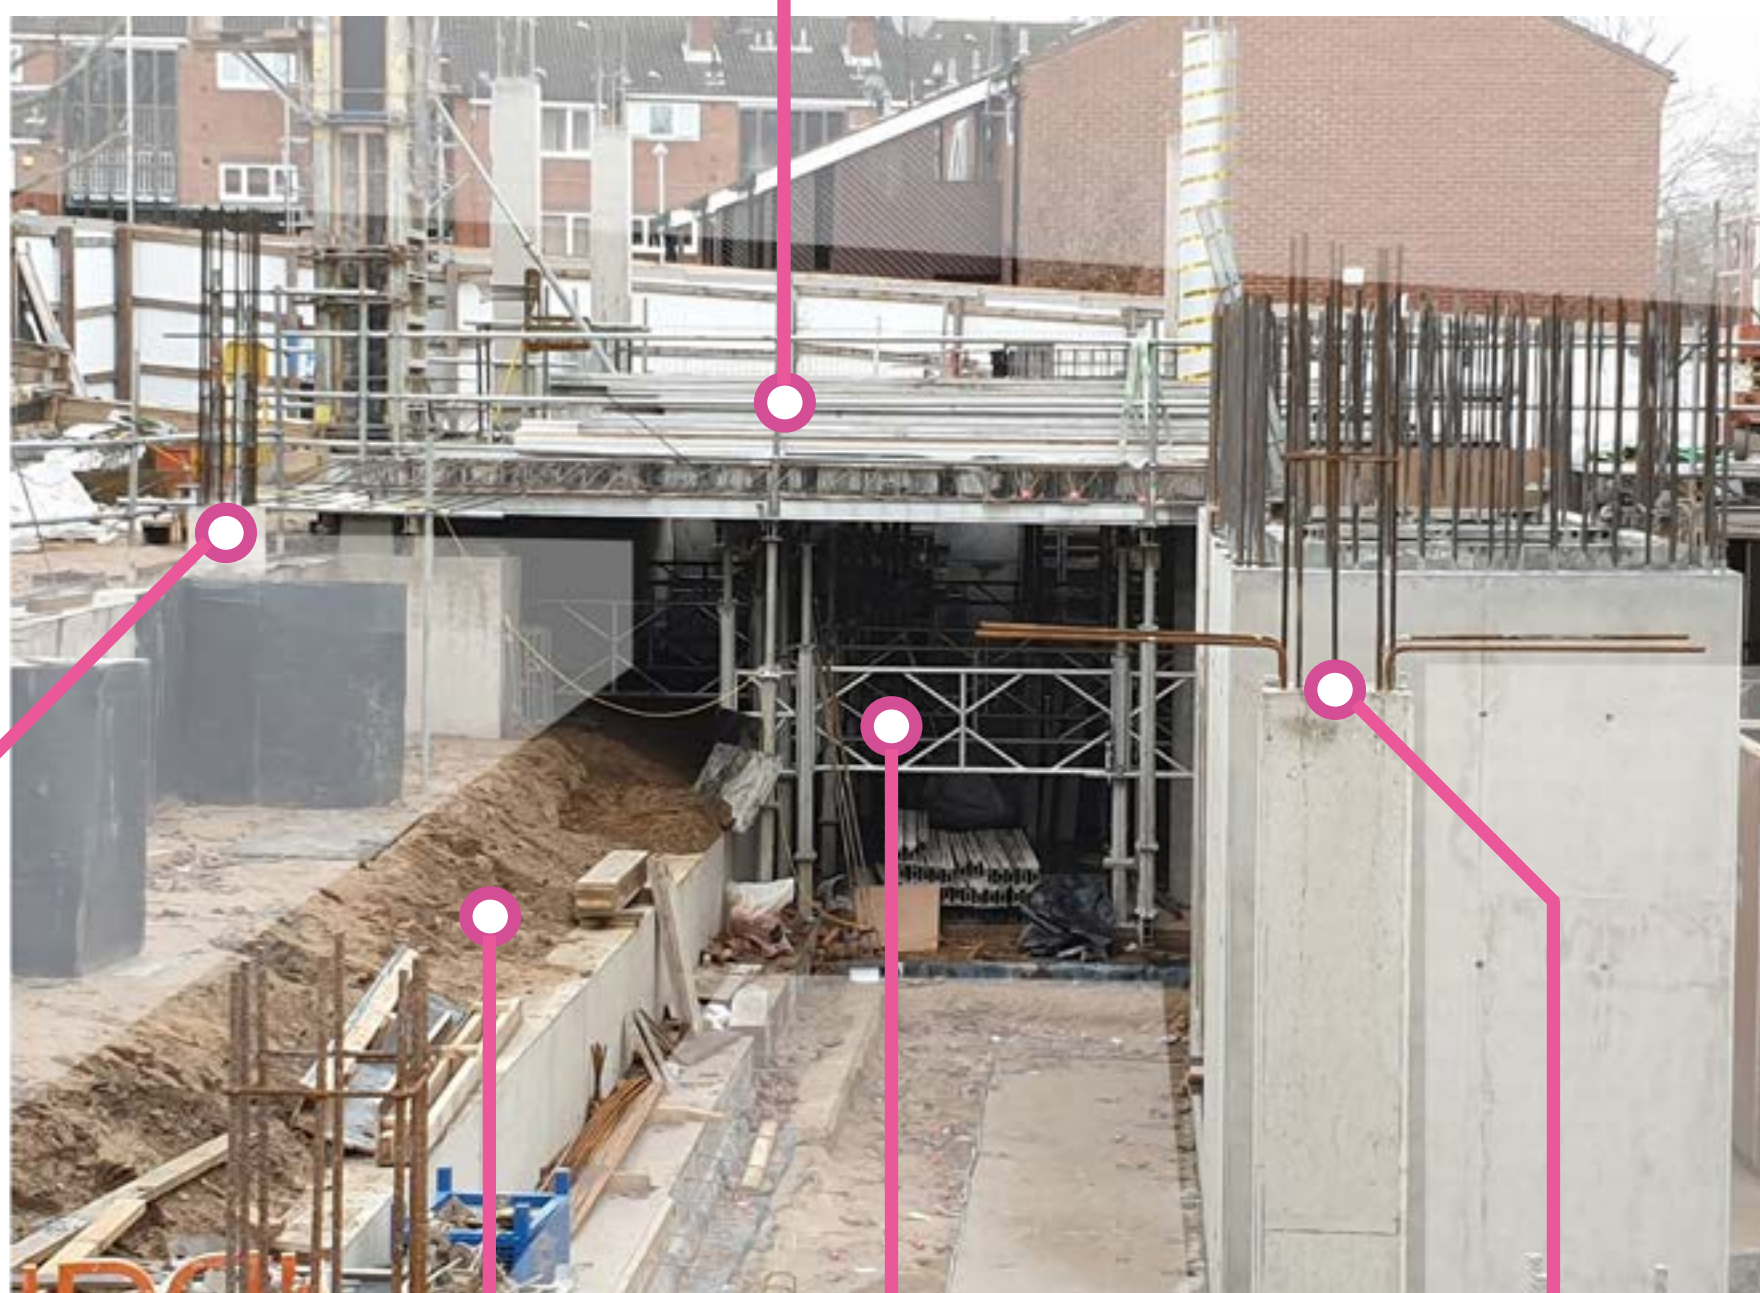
Steel and Floor Slab (Kentish-Brade, 2020).
